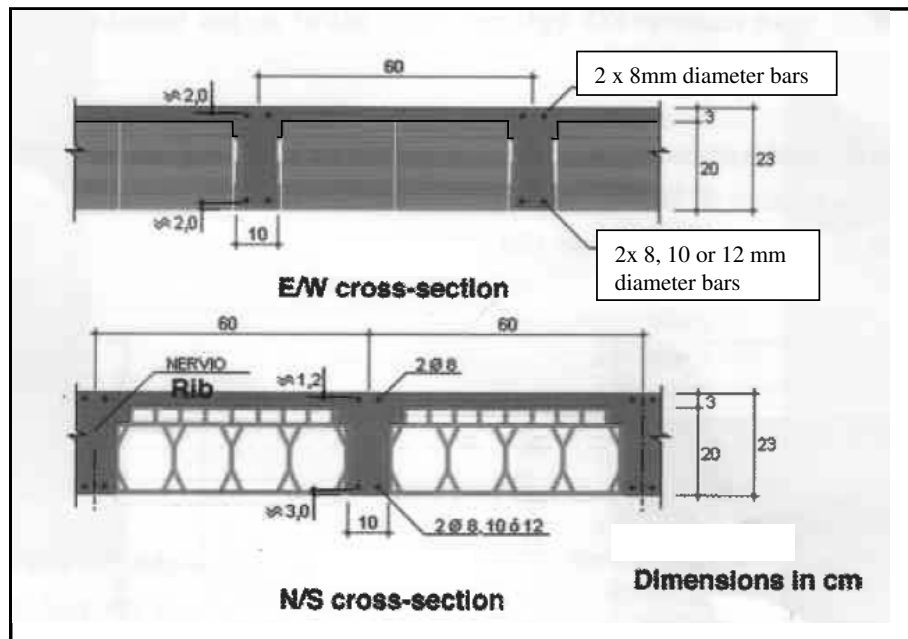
Waffle Slab construction (INTEMAC report⁷)
